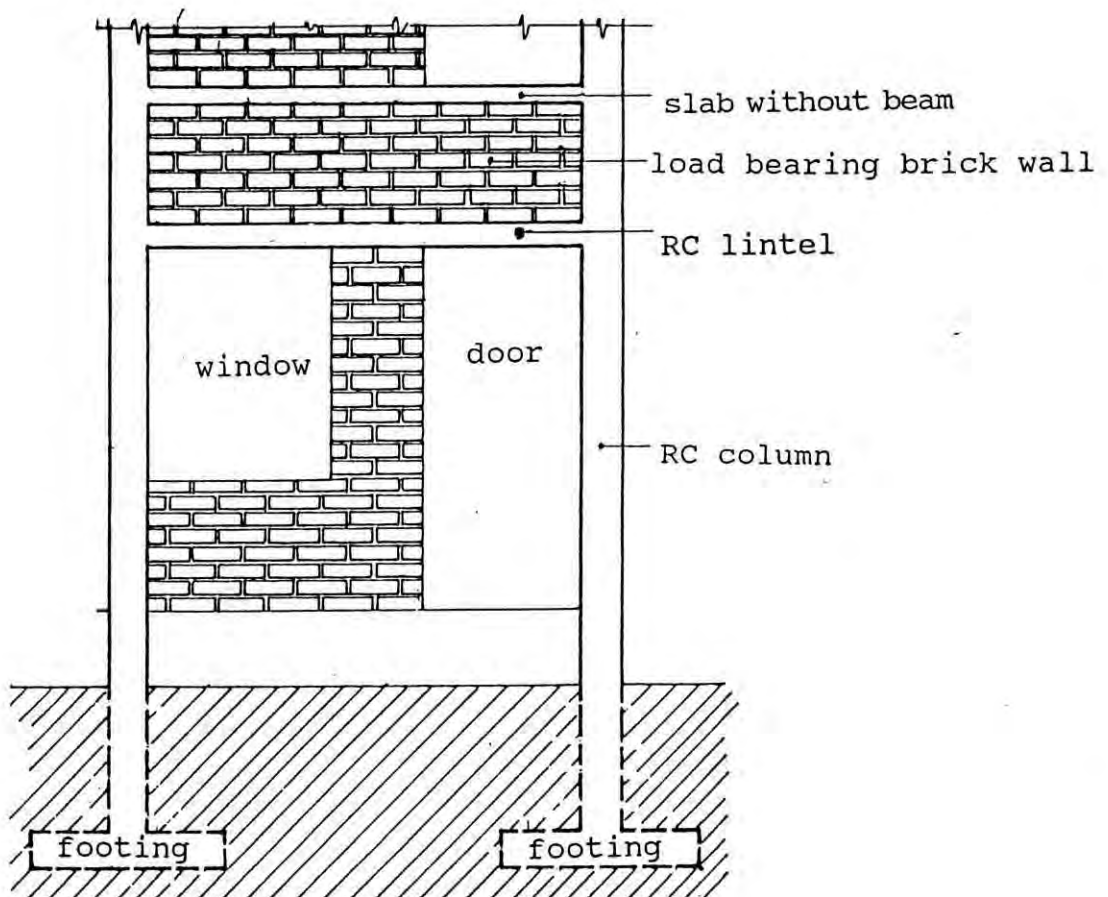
Load Bearing Brick Wall Over Reinforced Concrete Lintel In Framed Structure
